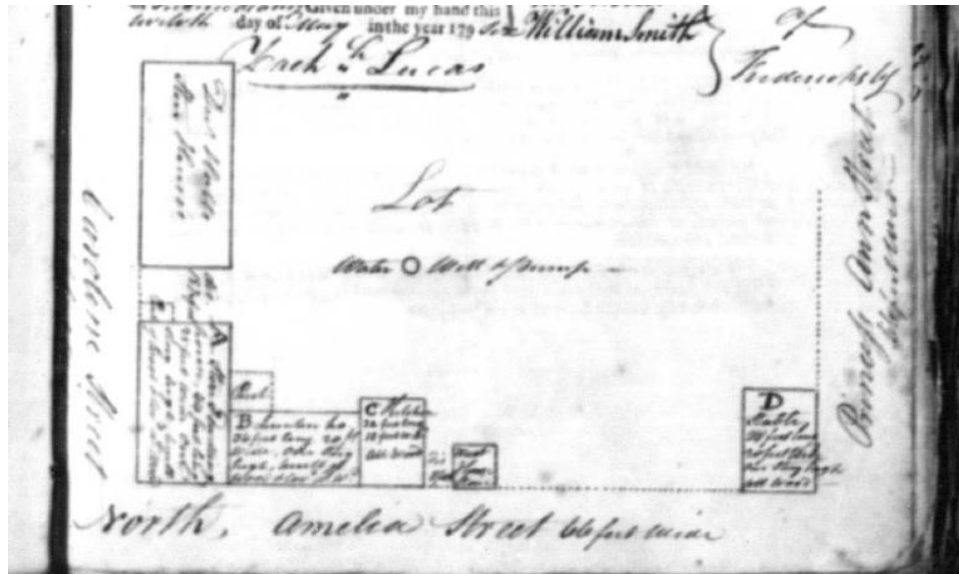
shows the earliest known footprint of Callender and Henderson's Buildings in 1796. The lumber house (B) and kitchen (C) stand behind the shop-house (A) on Caroline Street. Note that the two-story building does not yet exist. (Mutual Assurance Society of Virginia, microfilm)
